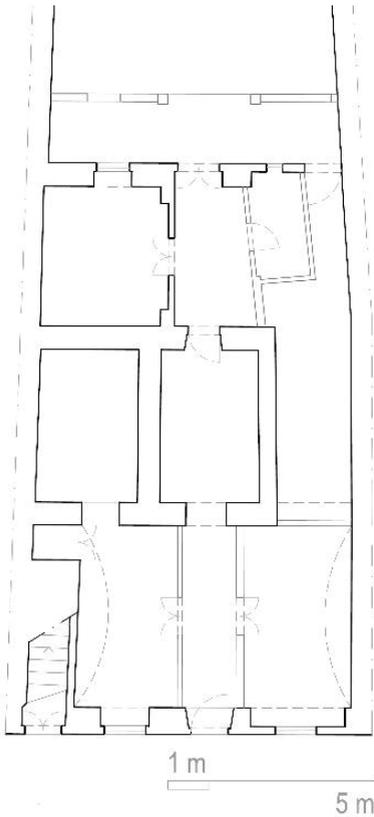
Groundfloor plan. Rua de Santa Catarina 13, Moura (Source: Rosado, 2021).
